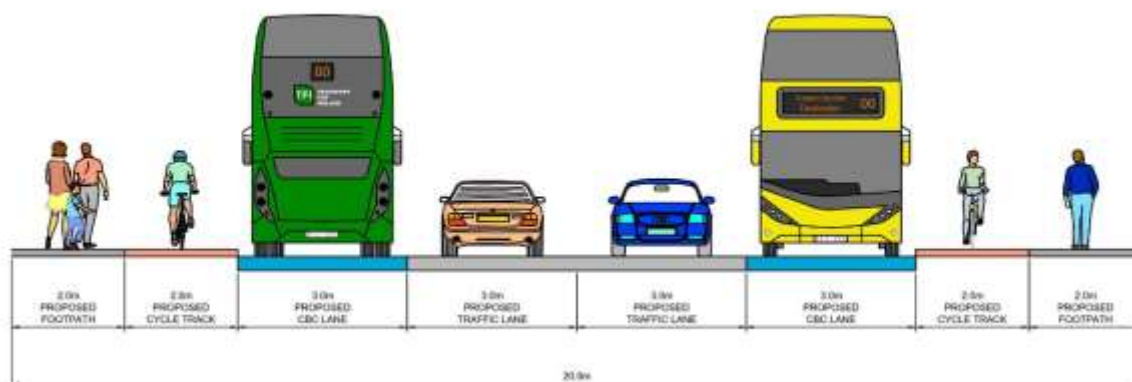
Typical Full Priority Cross Section (B - B & C - C)
